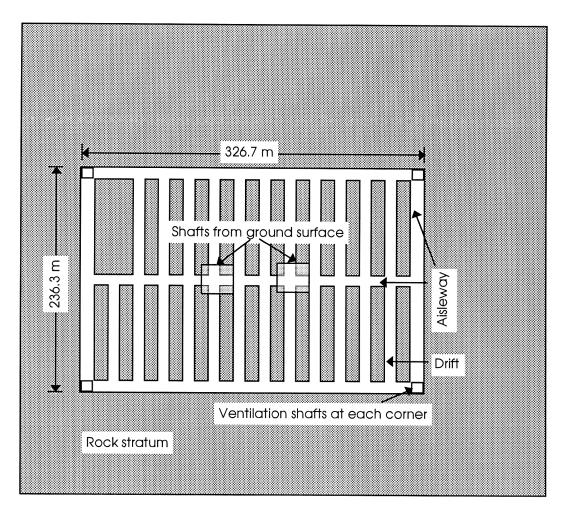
Underground Site Layout of the Mined-Cavity Storage Facility — Uranium Metal, 25% Case
